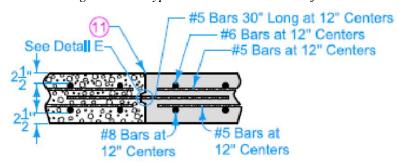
IowaDOT KS-2 longitudinal contraction joint (King, 2020)
